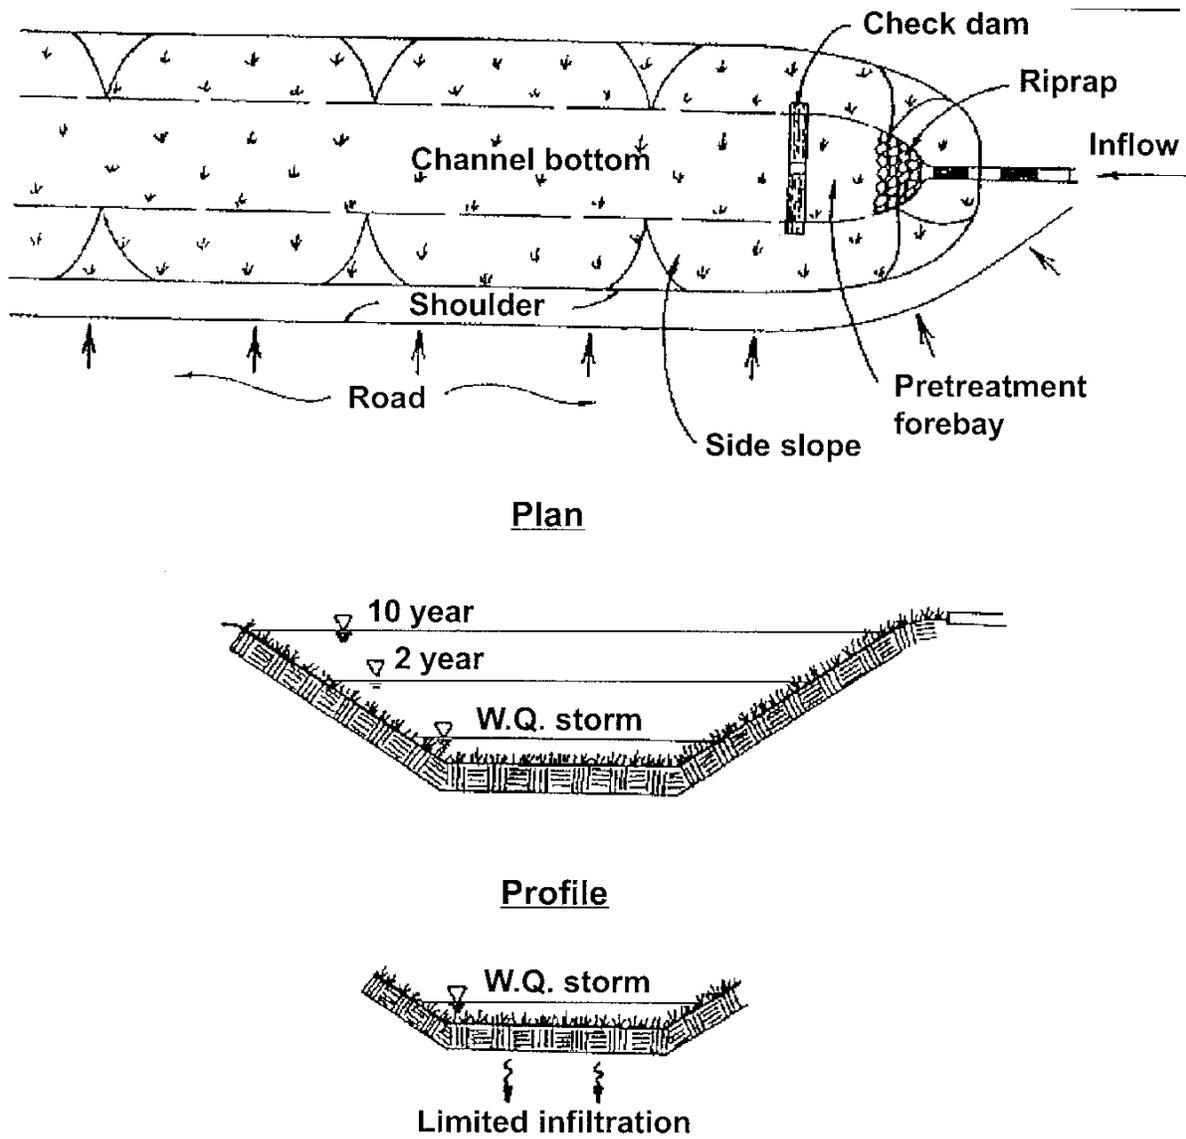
Grass Channel – Typical Plan, Profile and Section
